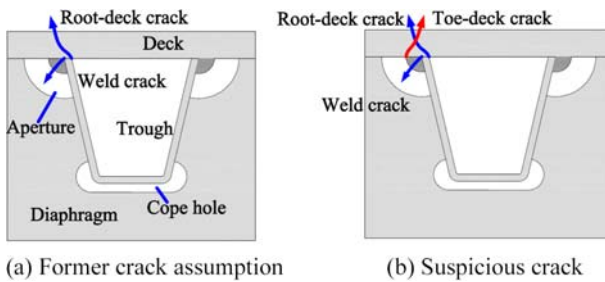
Fatigue cracks of trough-deck welded joint.
